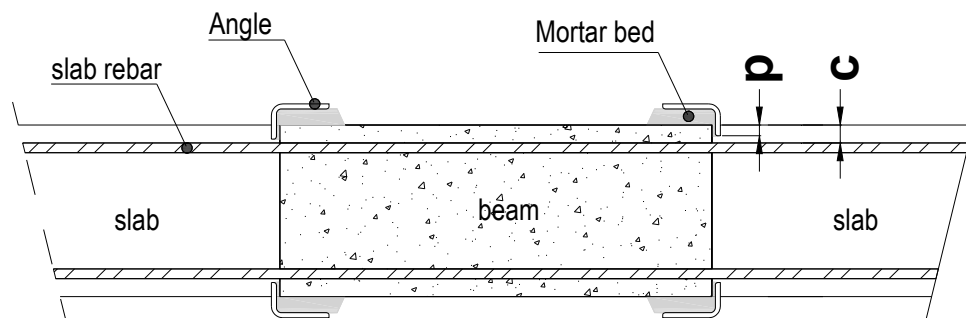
Cross section detail of application of steel angles in real cases (before installing stainless steel ribbons).
